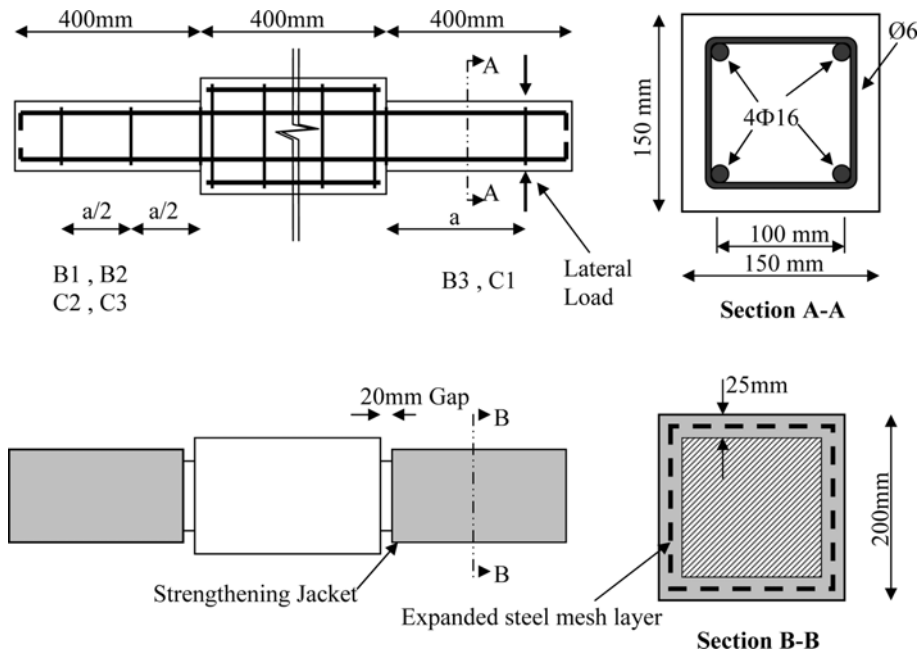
Details of original and retrofitted specimens, $a = 300$ & 260 mm for beams and columns, respectively
